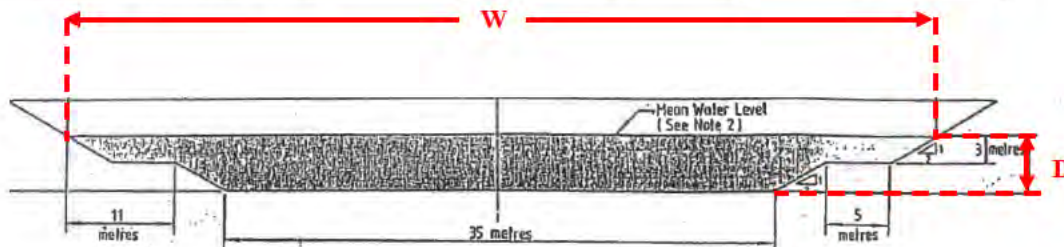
Provided dredged profile cross-section shape (extracted from Attachment 1)
